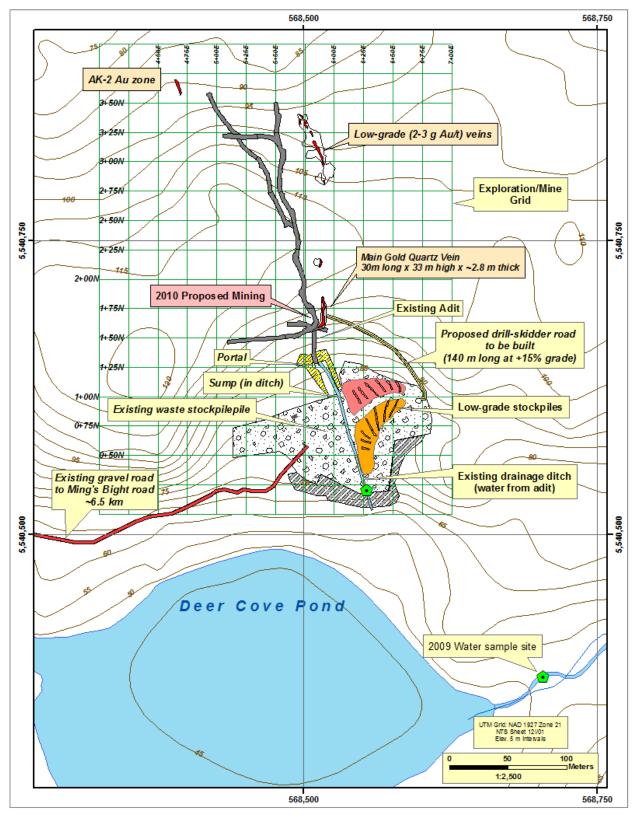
Deer Cove Gold Project detailed Site Plan (1:2,500)
